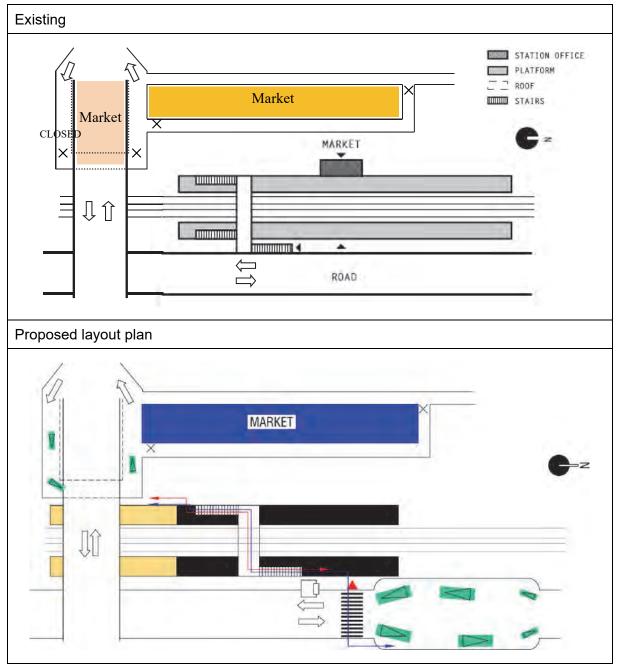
Existing and Proposed Layout Plan (Hanthawaddy Station)
